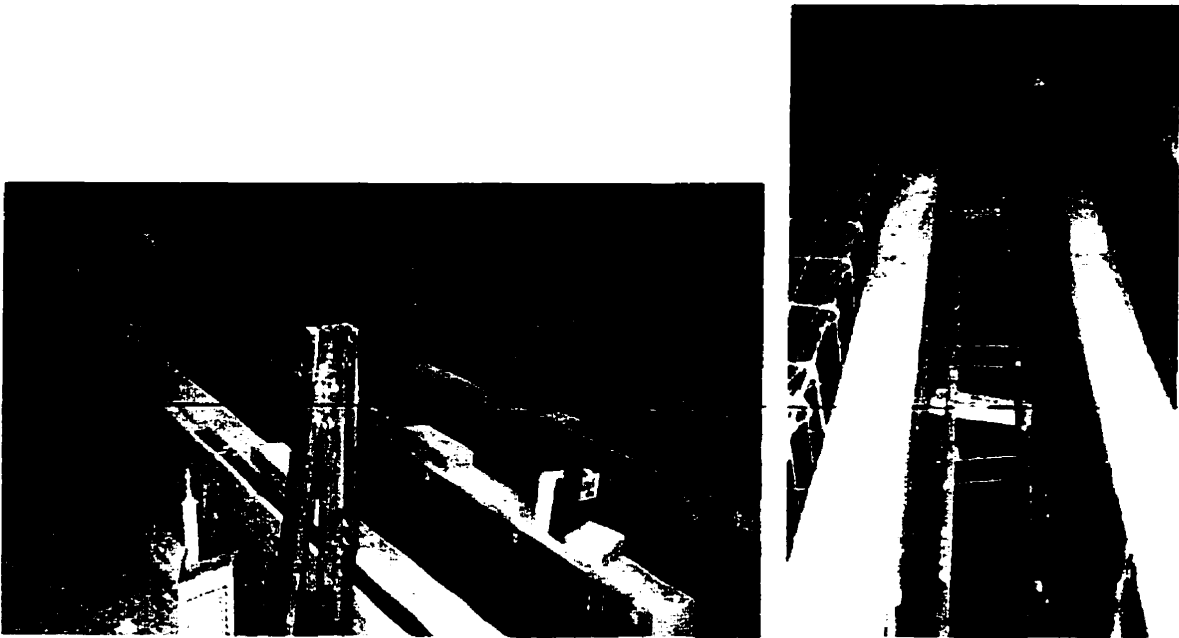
Formwork for casting of RWOA beam (along with other test beams)
